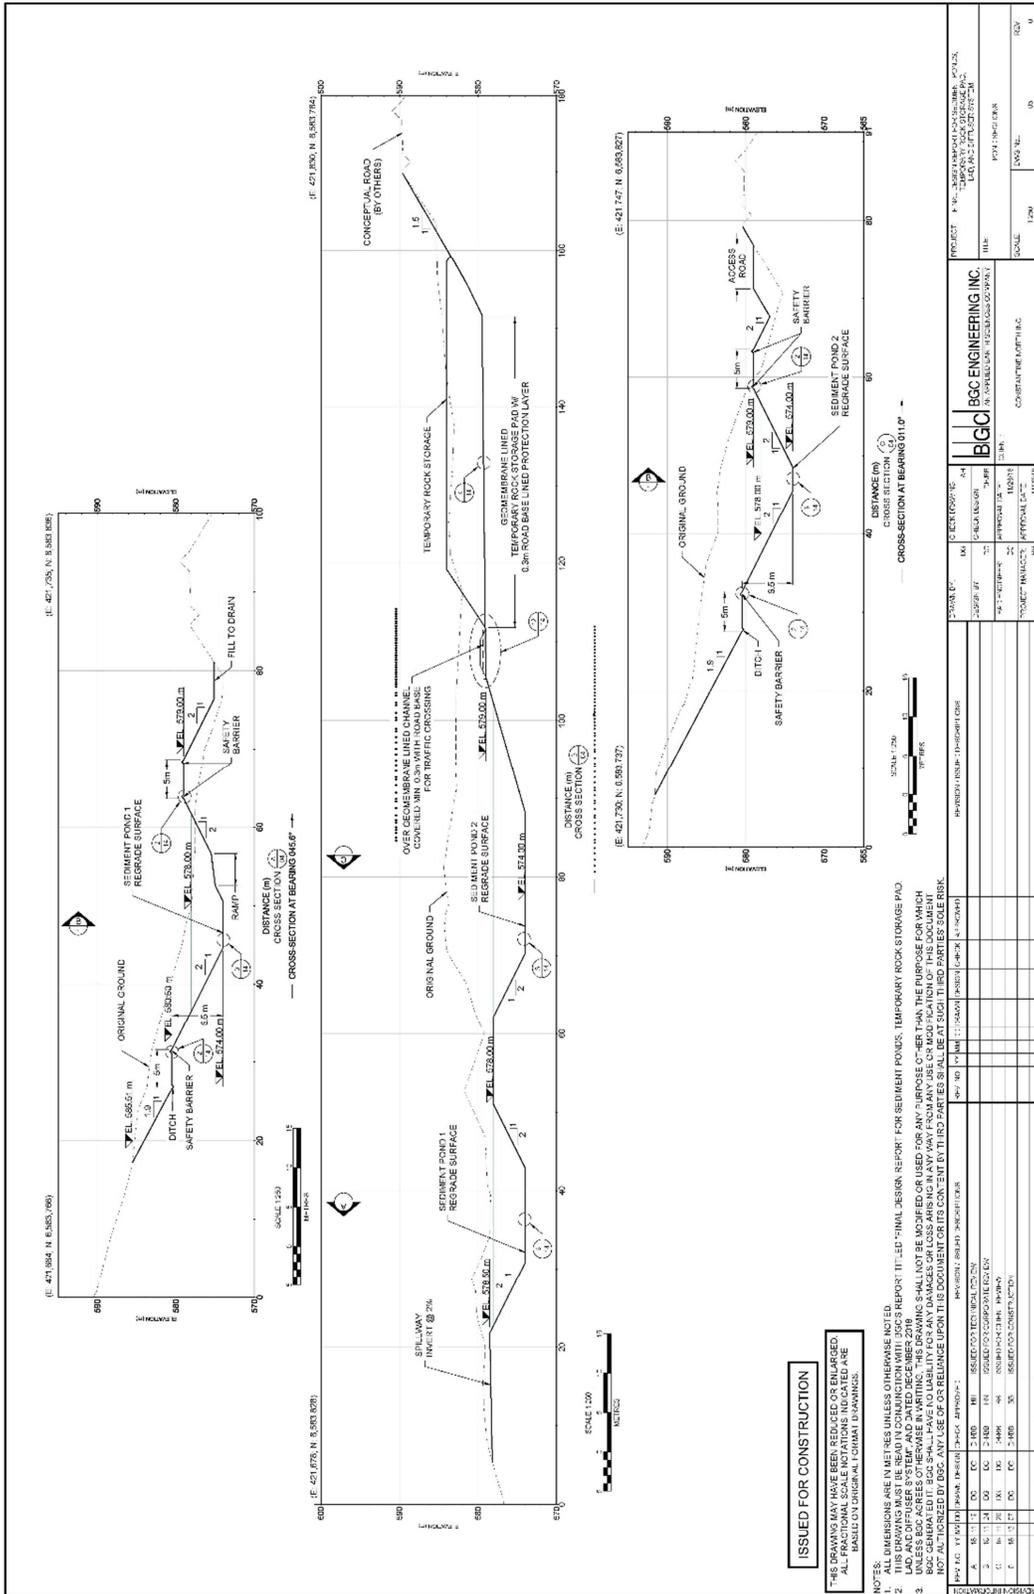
Engineered Drawings of Settling Ponds – Sectional View
